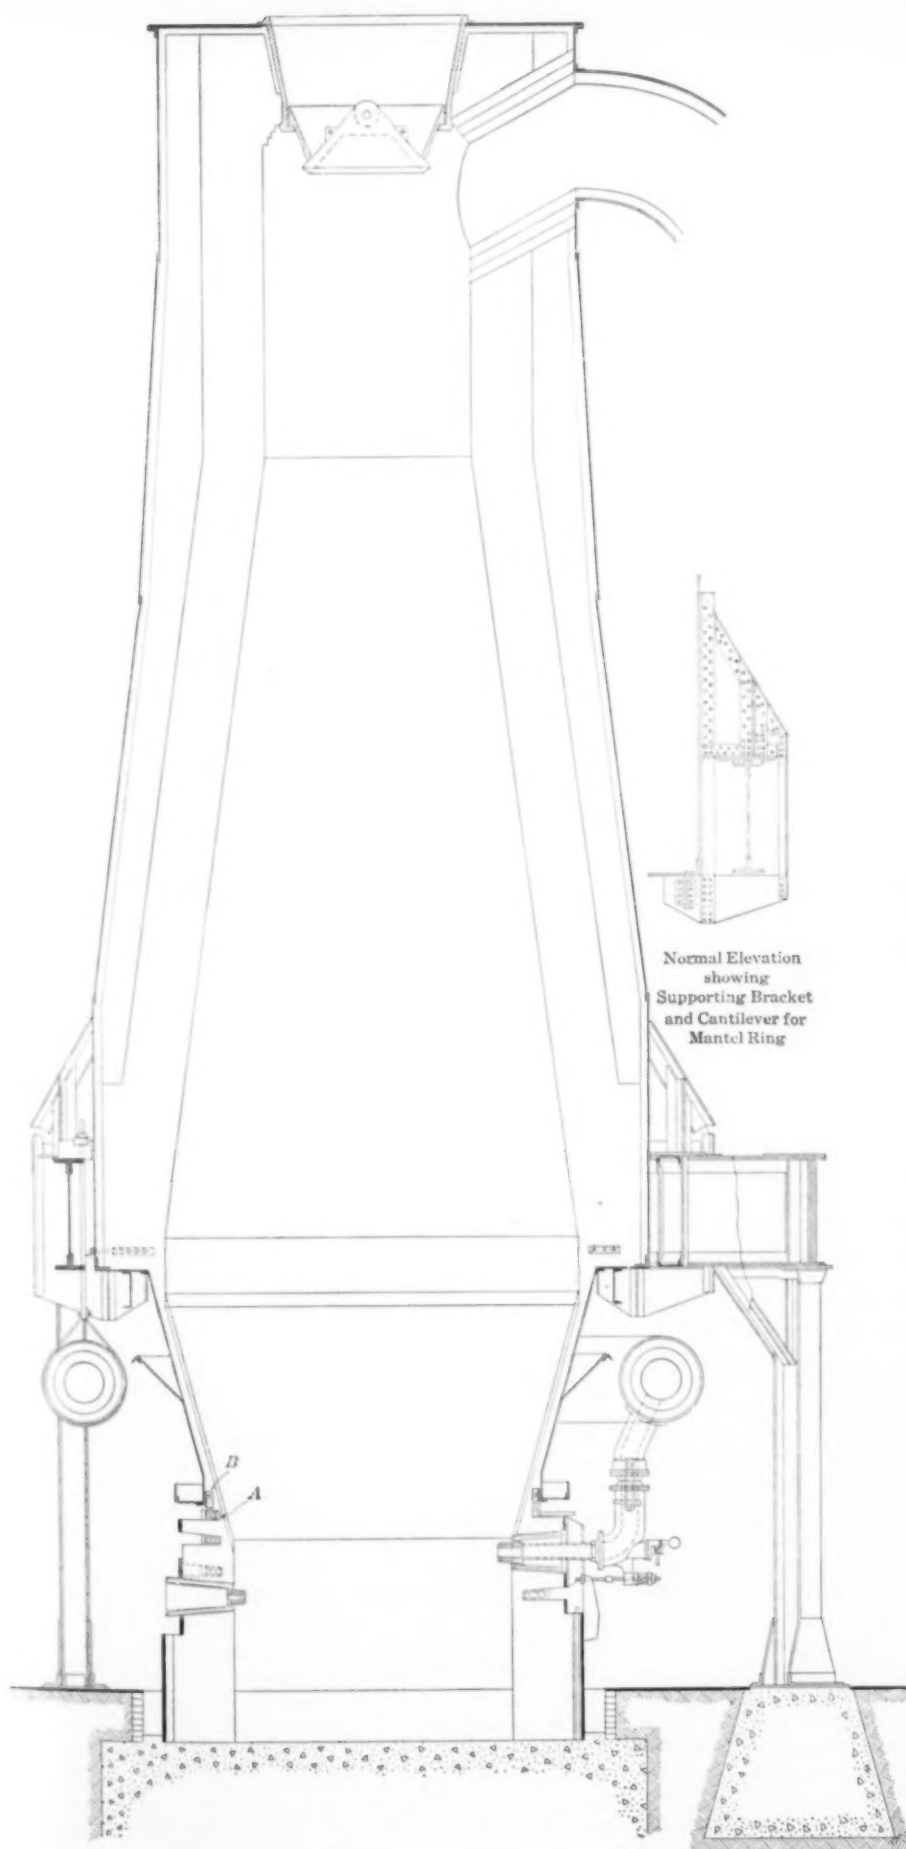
CHARCOAL FURNACE, SHOWING STEEL BAR JACKET CONSTRUCTION
